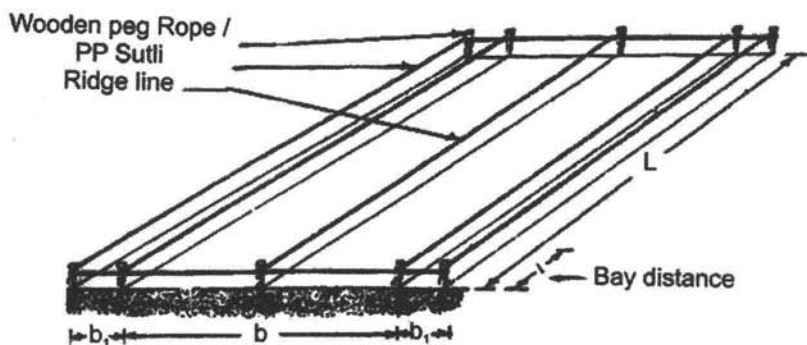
Marking the greenhouse floor area by pegs and ropes.
